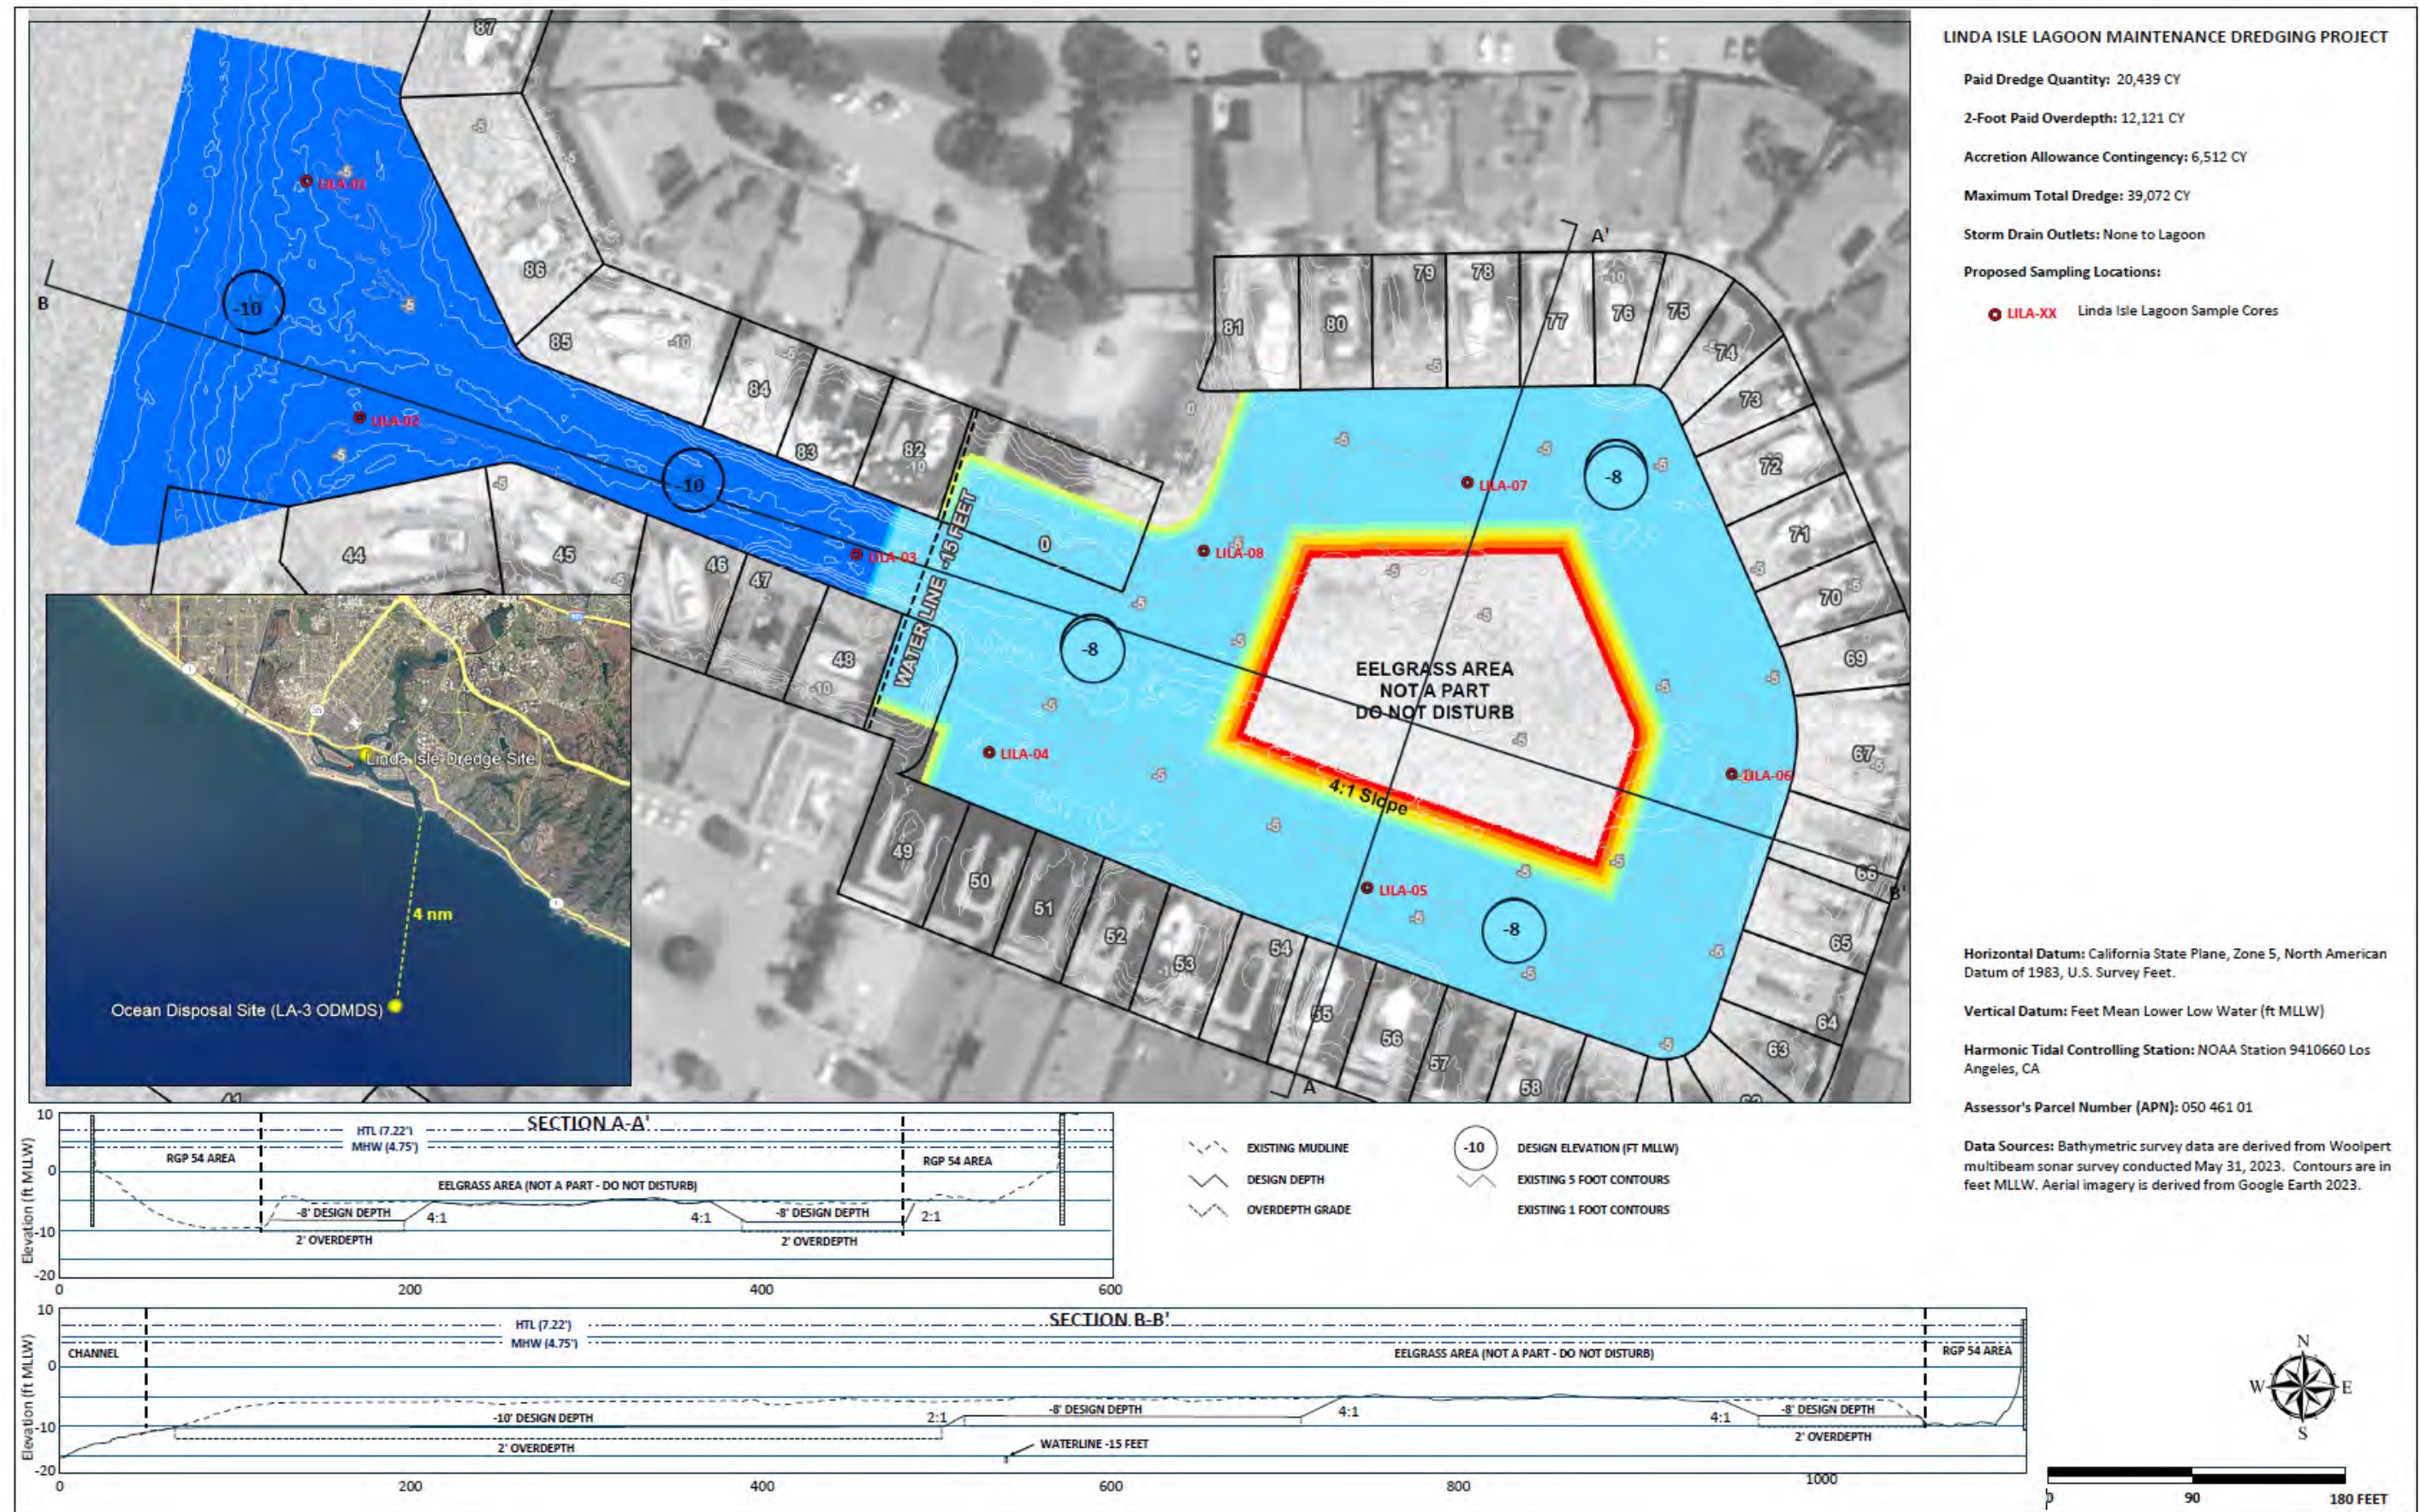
Dredge Plan and Proposed Sediment Sampling Locations
